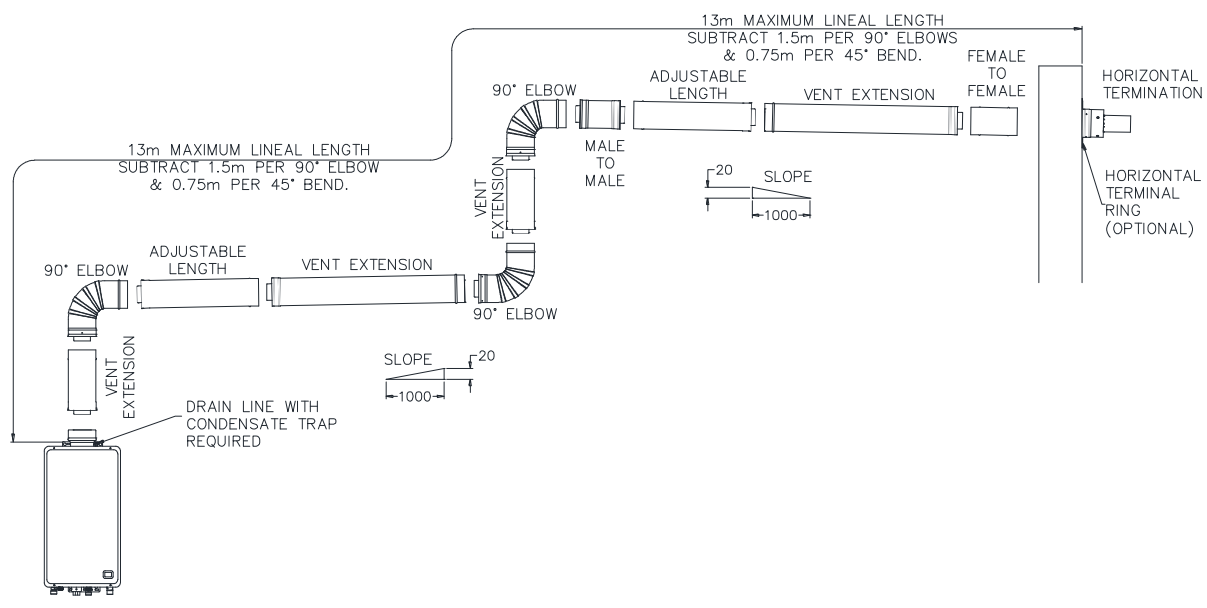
Typical Installation Horizontal Terminal with Multiple Vertical and Horizontal Sections
